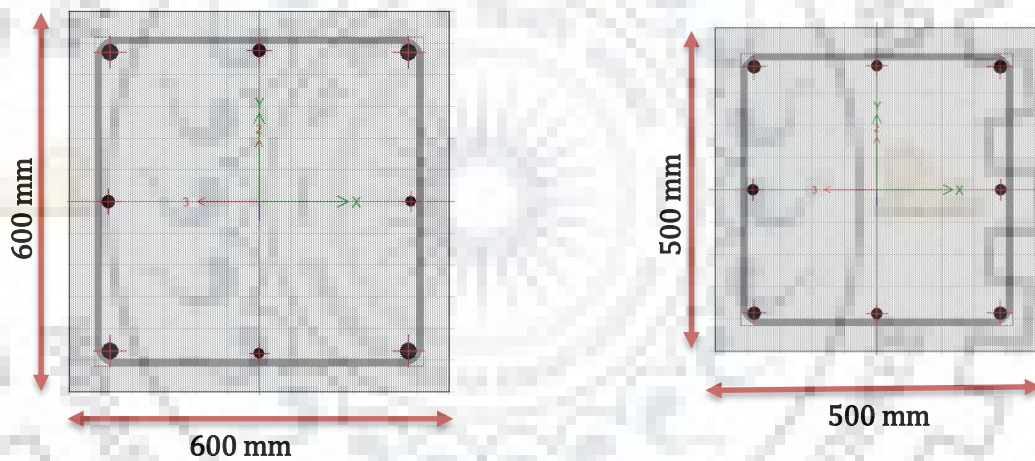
a) Sectional detail of Column @ Storey 1,2
